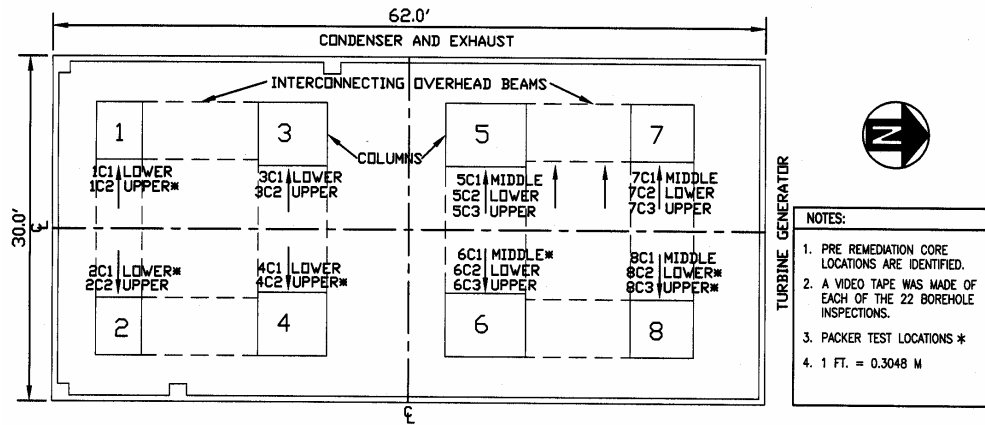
STG structure layout identifying columns, overhead beams, core locations, and Packer test locations
